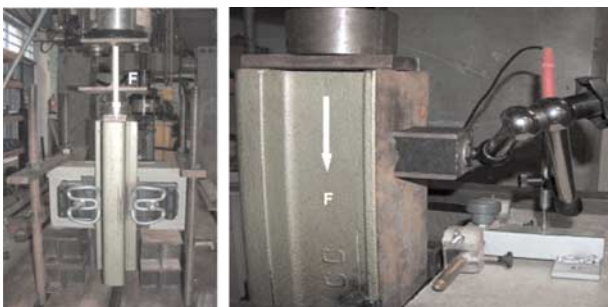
Longitudinal rail restraint test and detail of LVDT placement.
